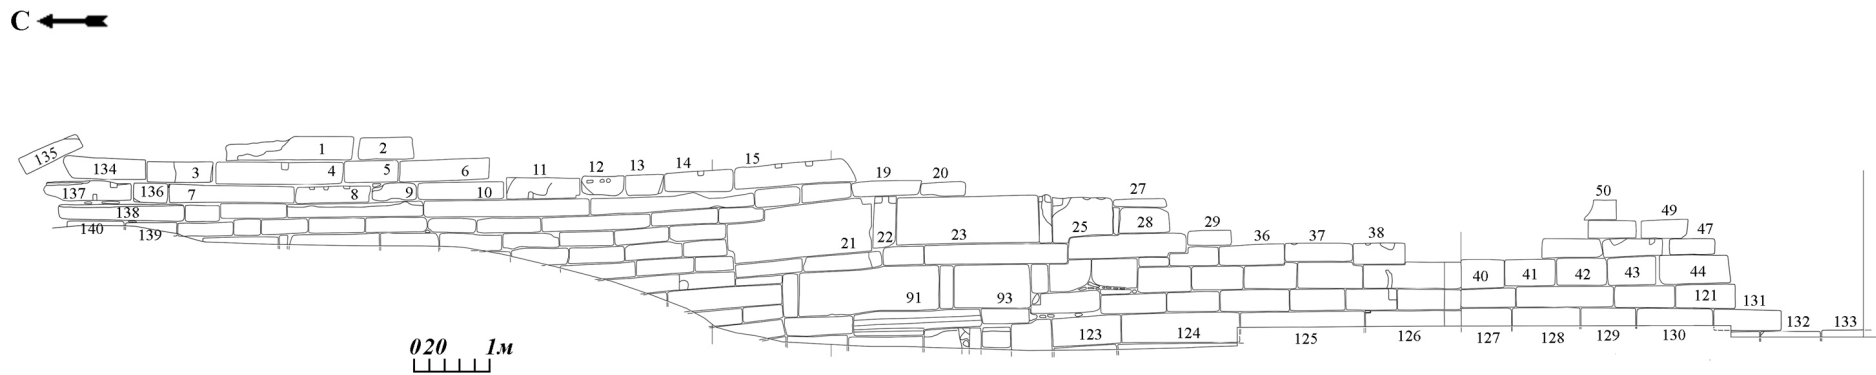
Monumental architectural structure on river Rubas. Wall No. 2. Western façade. 2018
